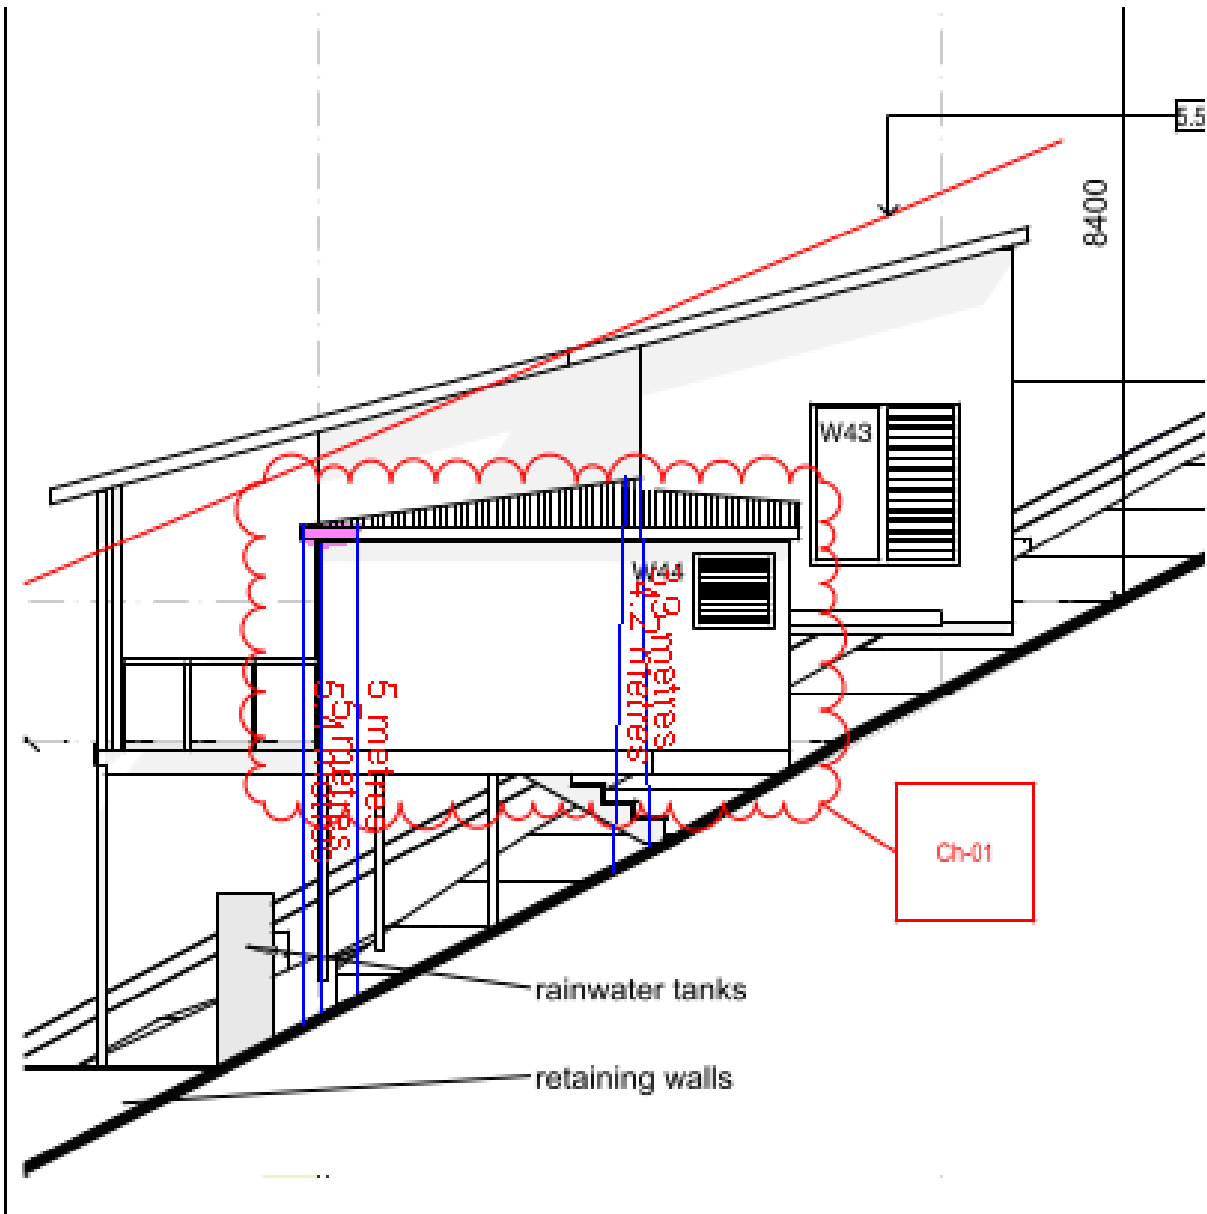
Boundary envelope encroachment shaded in purple (roof façade, guttering and small portion of the upper wall - southwest)
